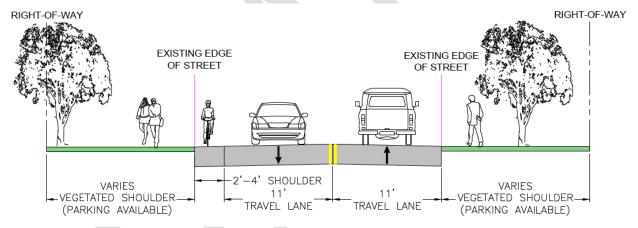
Coleman Avenue Existing Cross Section (Menlo Oaks) Looking East Toward Willow Road
